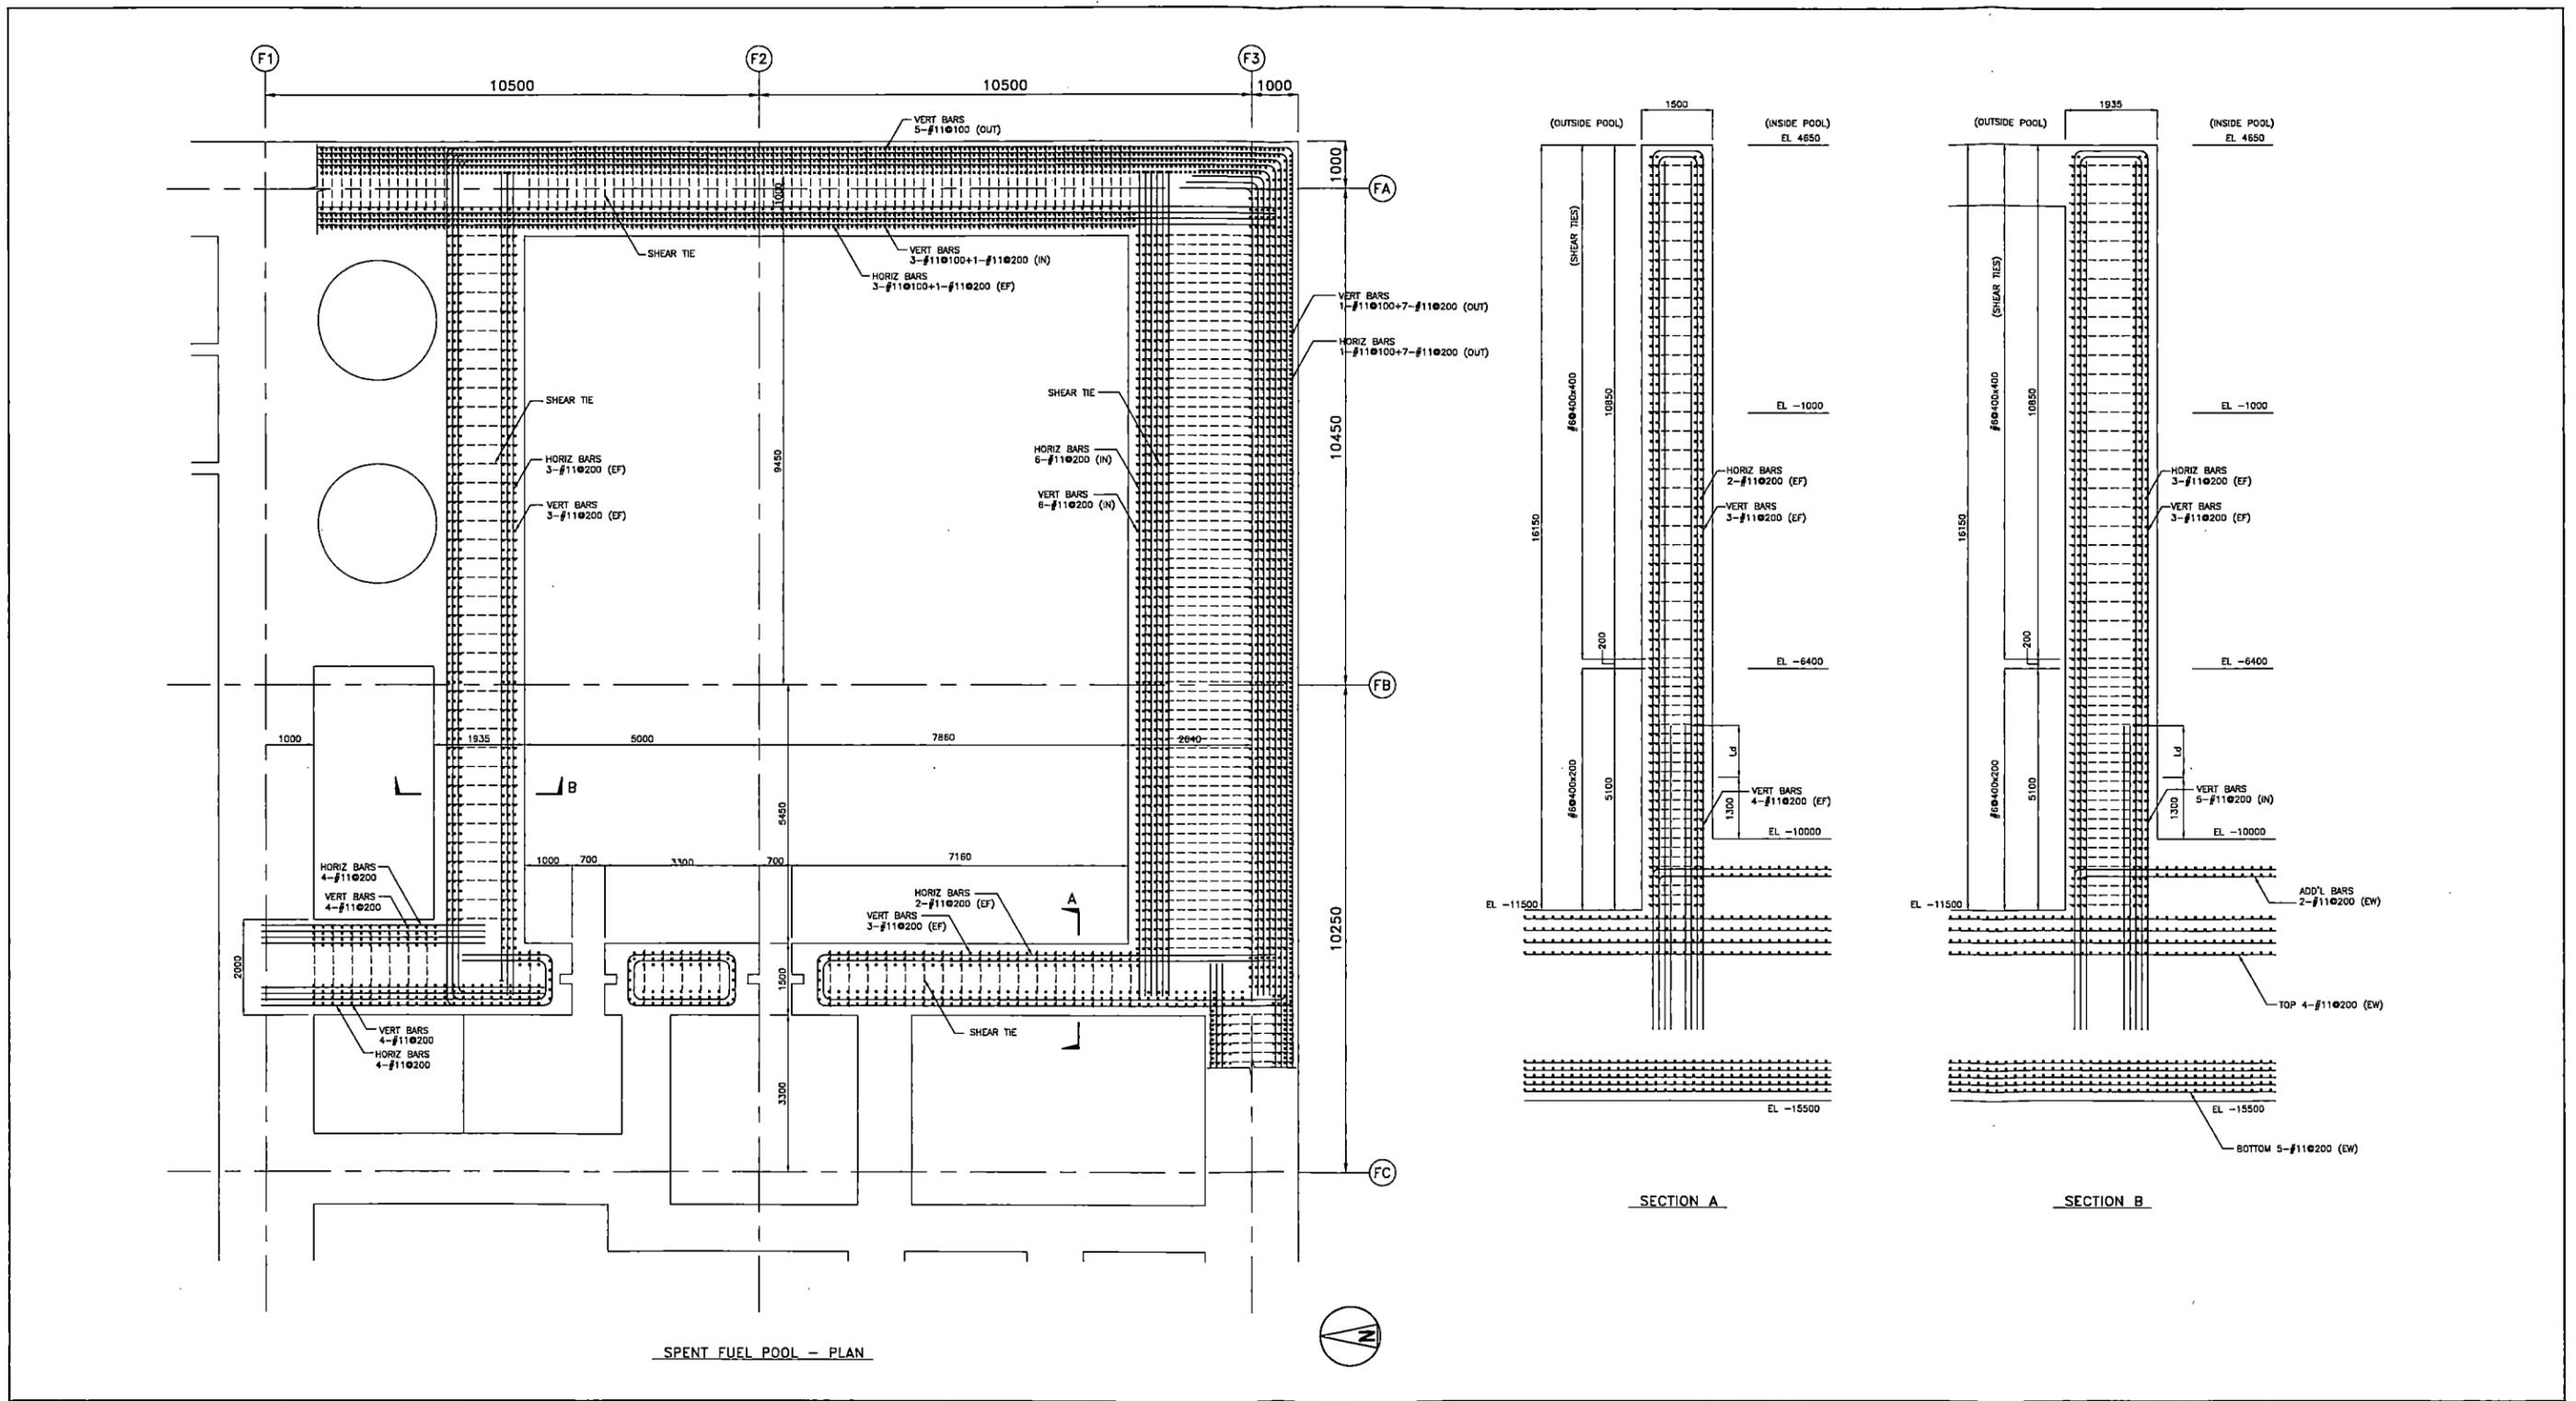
Reinforcing Steel of Spent Fuel Pool Walls
